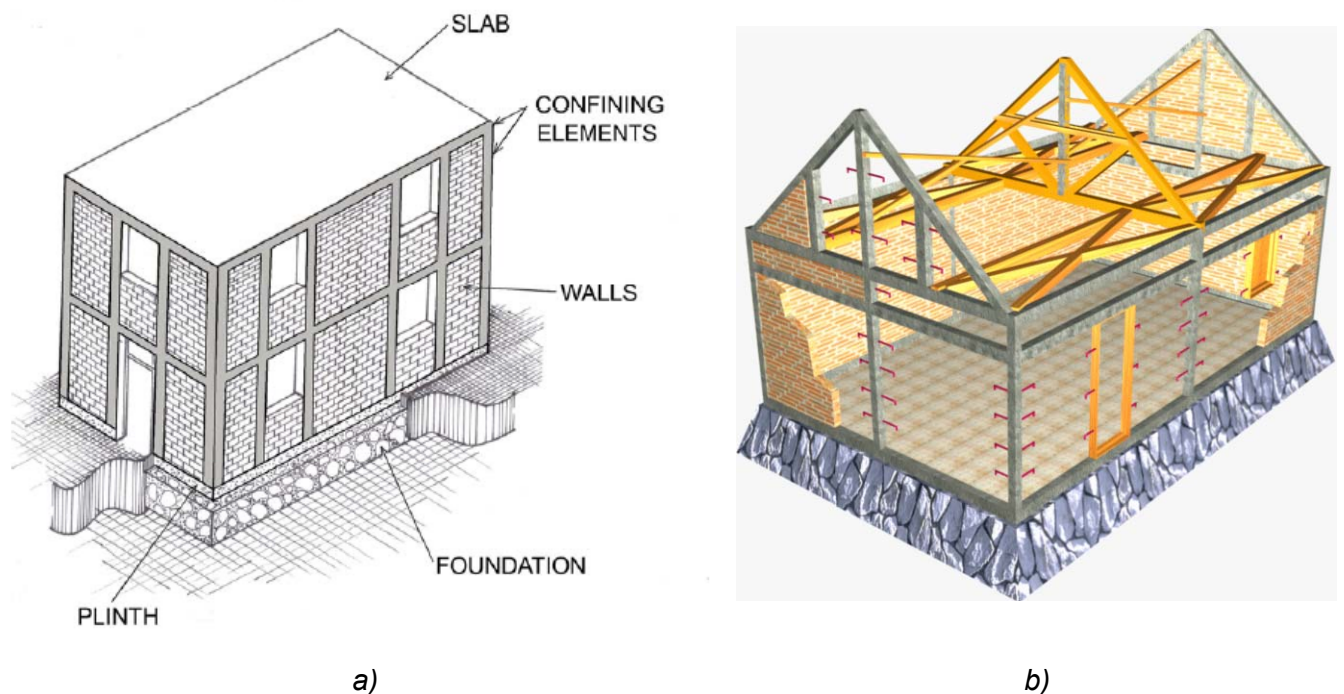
A typical confined masonry building: a) flat RC roof (Brzev, 2008), and b) pitched timber roof (Boen, 2009).
